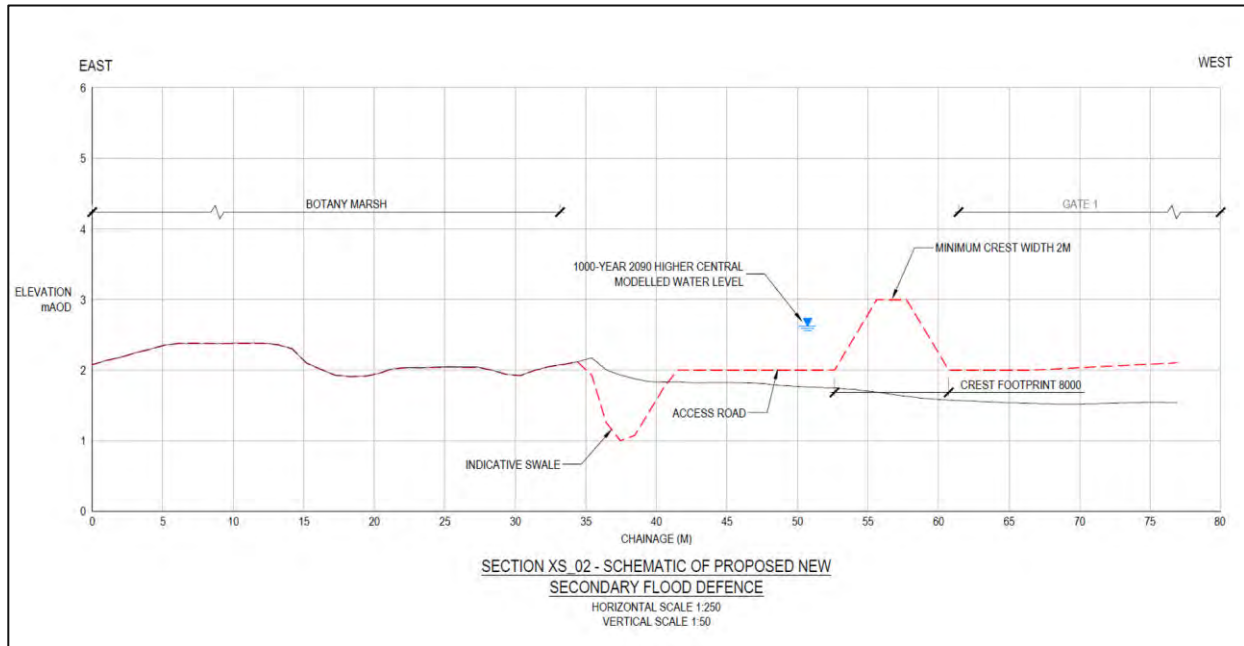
Cross section of the proposed secondary flood defence along the east of the Proposed Development, cross section location shown on Figure 4-15.
